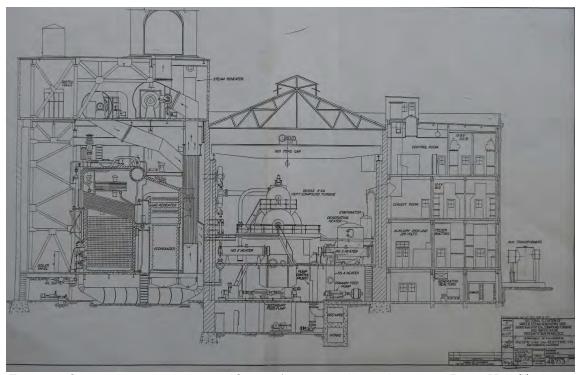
Sectional (north) elevation of Station A showing (from left to right): Boiler Hall, Turbine Hall, and Switching Center. Drawing by PG&E Engineering Department. Source: Associate Capital.
